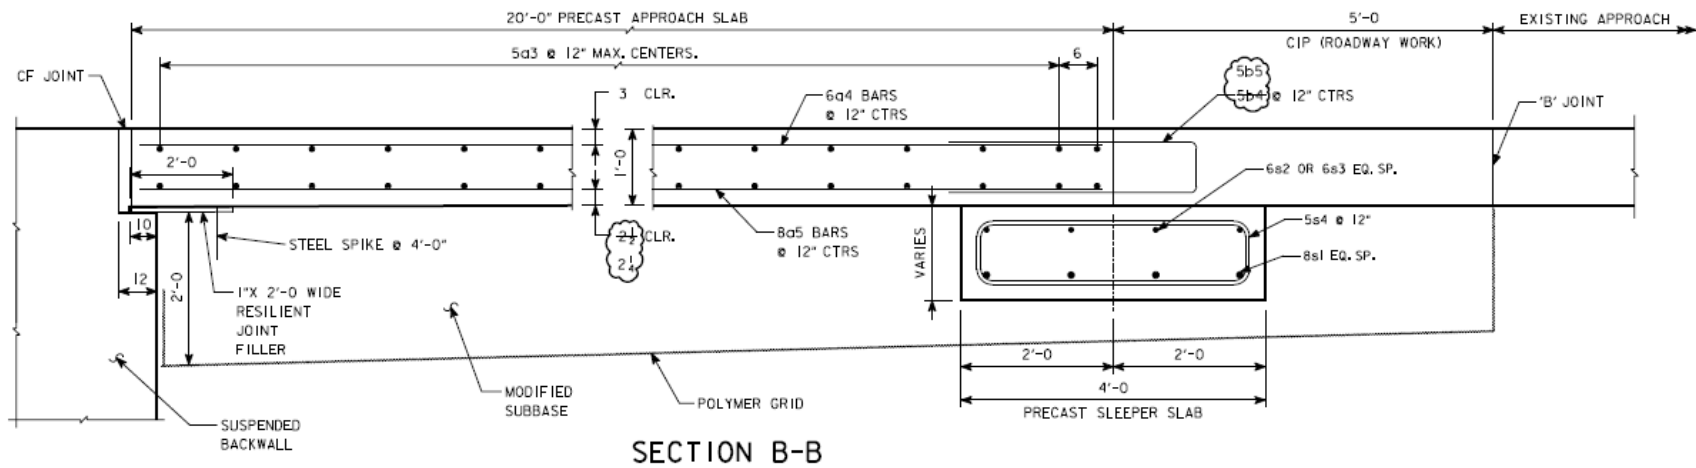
111 Pottawattamie Approach Slab Section (Iowa DOT)
